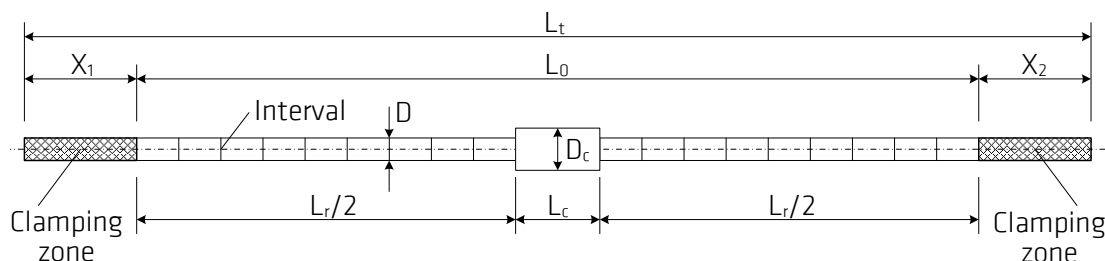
Geometry of specimen with coupler before testing with definition of dimensions
